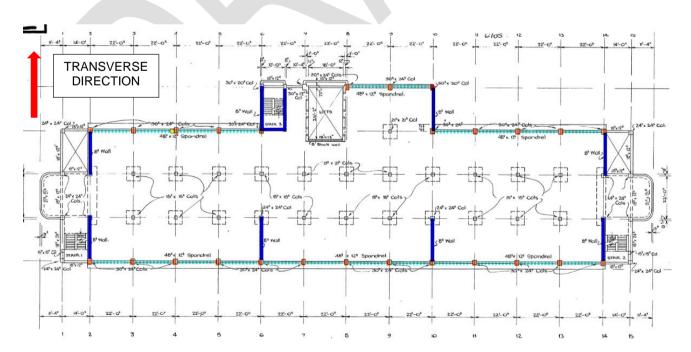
Typical shear wall layout above the ground floor (dark blue lines)
